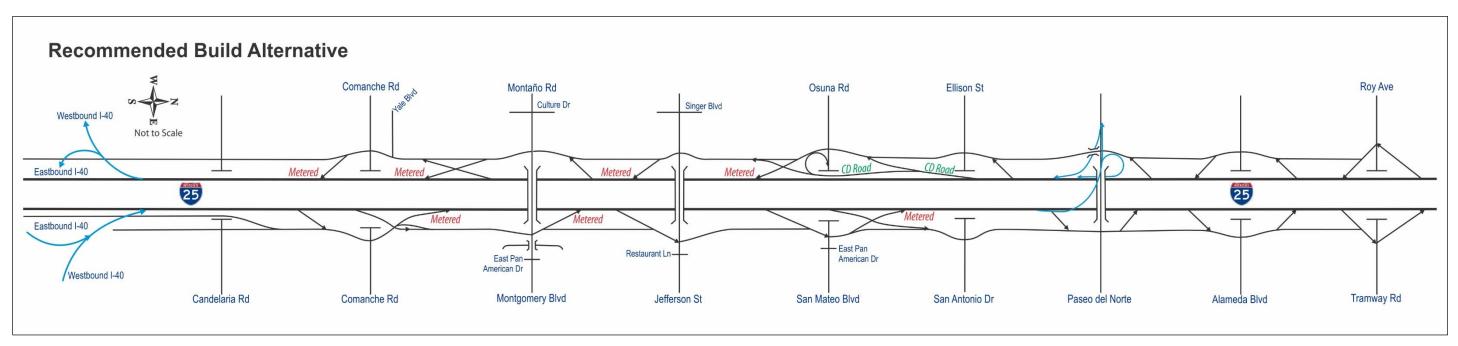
, Updated Ramp Layout Schematic for the Recommended Build Alternative
